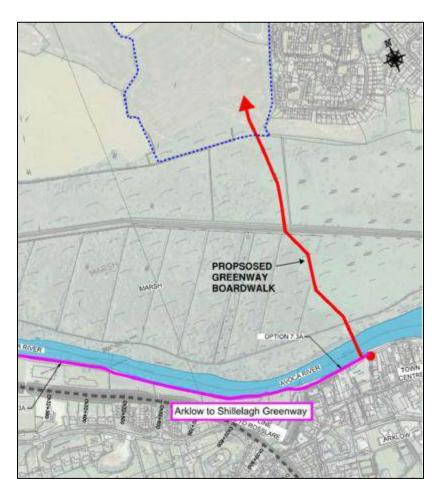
Proposed tie in of Boardwalk to Arlow to Shillelagh Greenway (Image Source: Greenway Boardwalk: Outline Construction Methodology)
